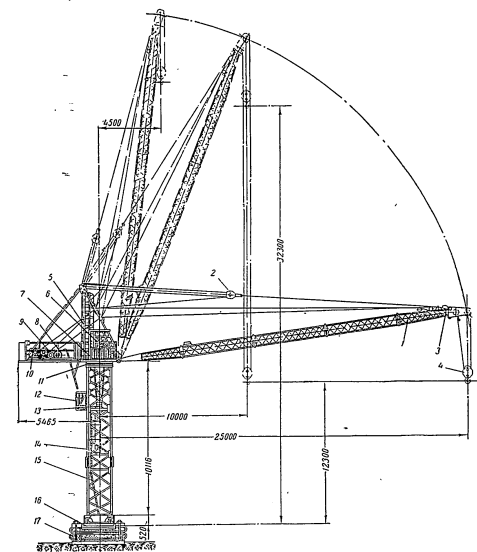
Model T-178 small-size, stationary, full-swing tower crane to be installed on ground and fastened by ballast: 1 — boom; 2 — boom lifting tackle; 3 — hoist limiter; 4 — hook with attachment; 5 — post with pulleys; 6 — cab; 7 — swinging gear; 8 — load-lifting winch; 9 — boom-luffing winch; 10 — counterweight cantilever with gears; 11 — upper supporting rollers; 12 — foot-bridge; 13 — bottom support of tailpiece; 14 — tower; 15 — ladders; 16 — supporting beam; 17 — ballast.
